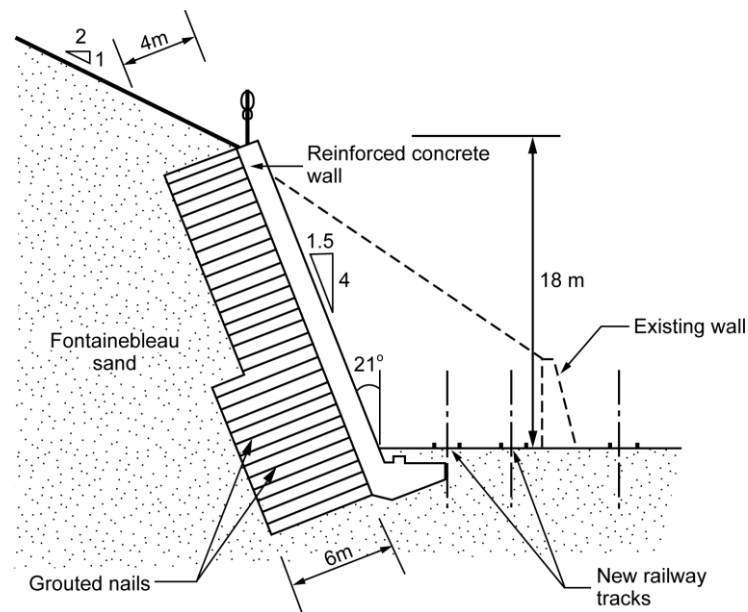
Section through the first soil-nailed wall in the world, built at Versailles, France, in 1972/73 (from Clouterre, 1991)
